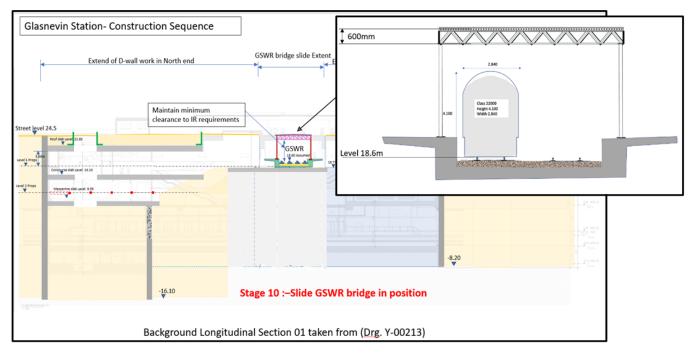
Cross section of crash decks over GSWR and MGWR
